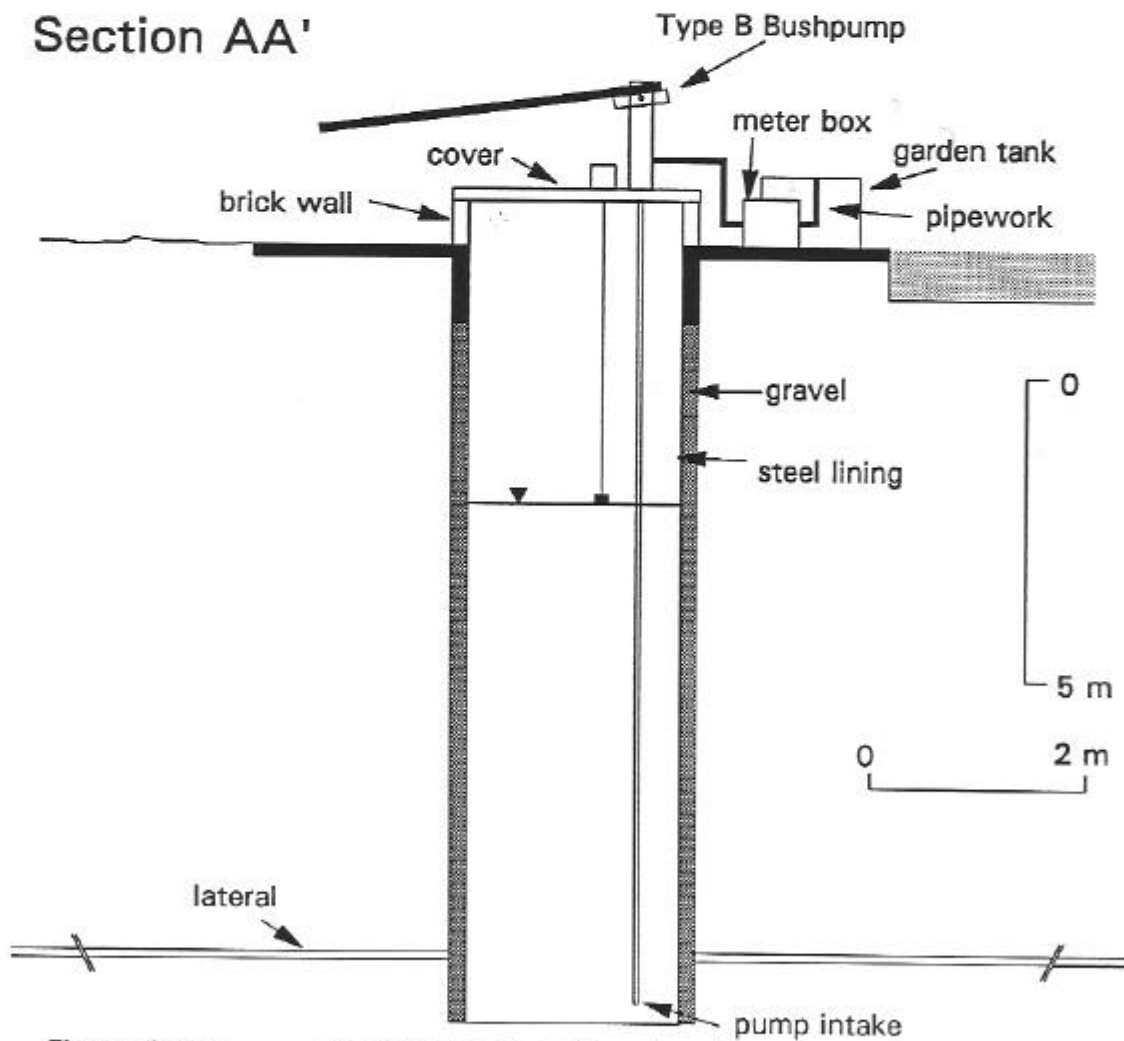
Collector well and headworks construction, site 5, Mawadze
